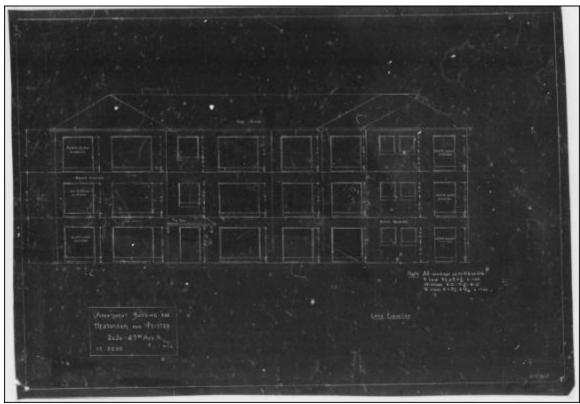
"Apartment Building for Heathman and Peister 2020-43rd Ave. N. ... [Building Permit] 412969" Lake Elevation
